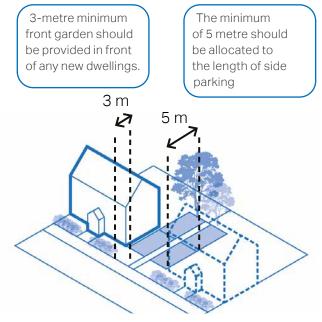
Illustrative diagram showing an indicative layout of on-plot side parking.
